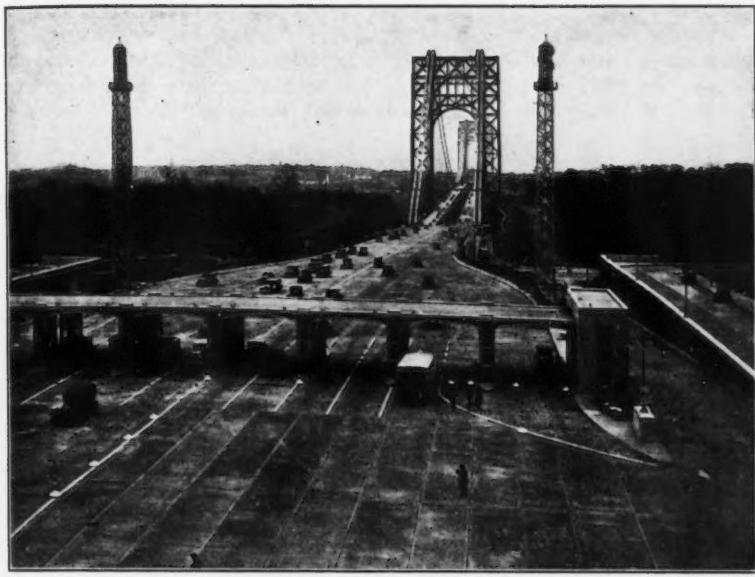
TOLL COLLECTION FACILITIES, NEW JERSEY APPROACH, GEORGE WASHINGTON BRIDGE.
